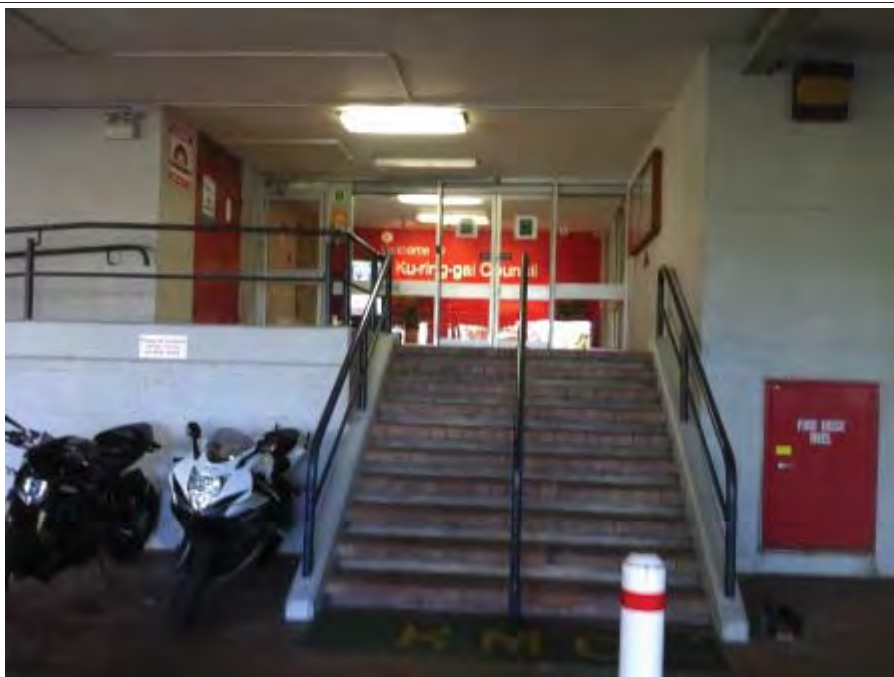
Stairway from undercroft parking area into council administration building (looking towards the east)
